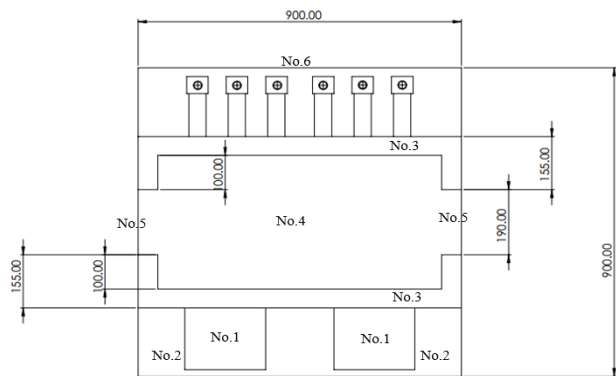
Rectangular downdraft open-top kilns in firewood, Top view
